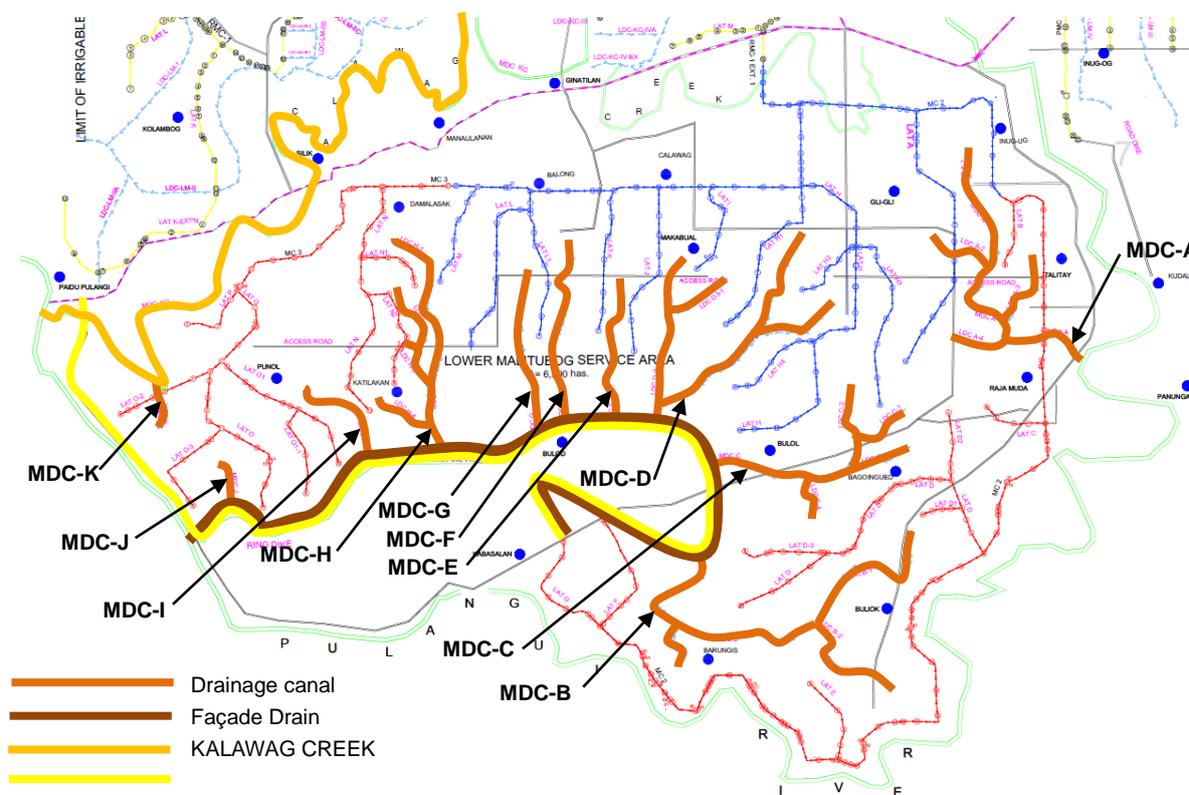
Plan of Drainage Canal System for LMSA
